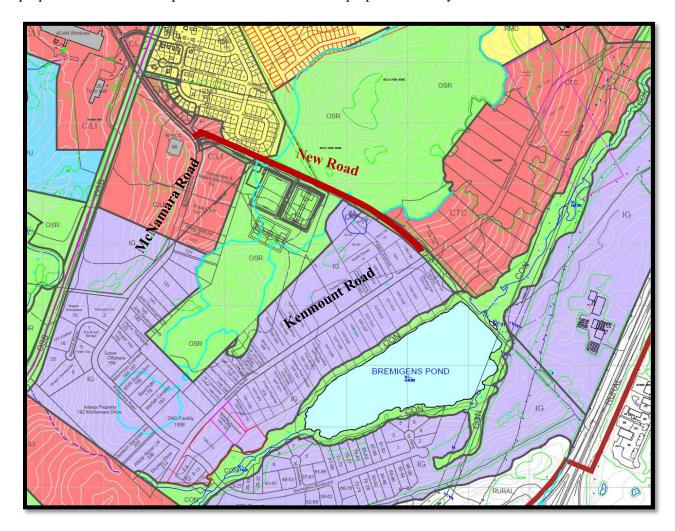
Alignment of Proposed Road from McNamara Road to Kenmount Road
